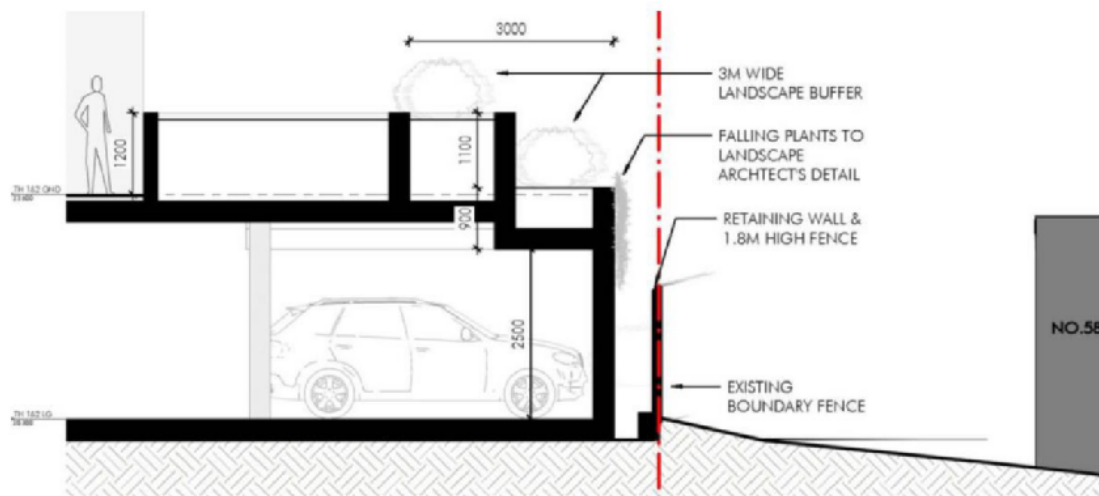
Showing the relationship of the proposed development with the boundary of No. 58 Beaconsfield Street, (Source architectural plans as amended, prepared by Nettelontribe)
